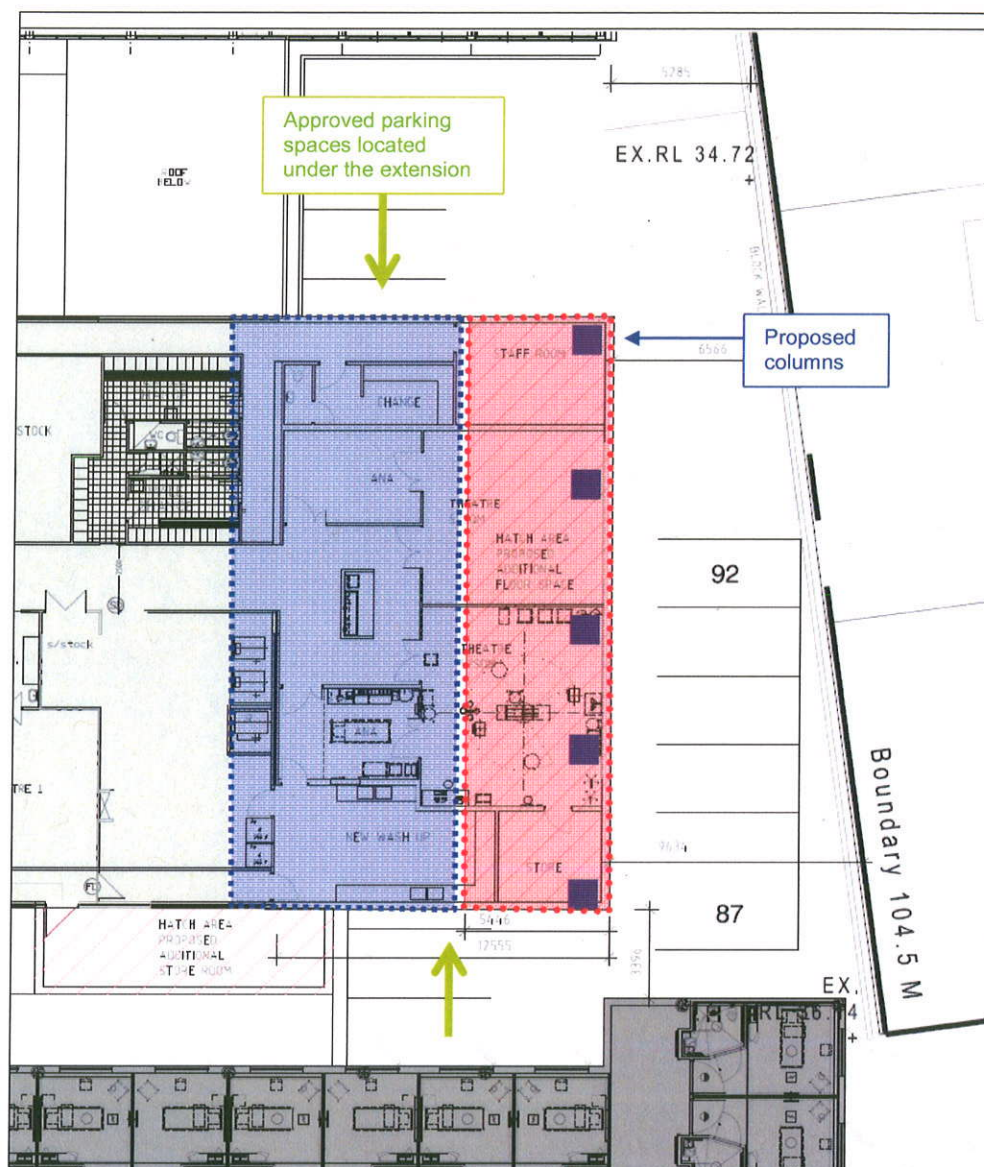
Approximate location of columns to the East Extension highlighted in 'blue'
